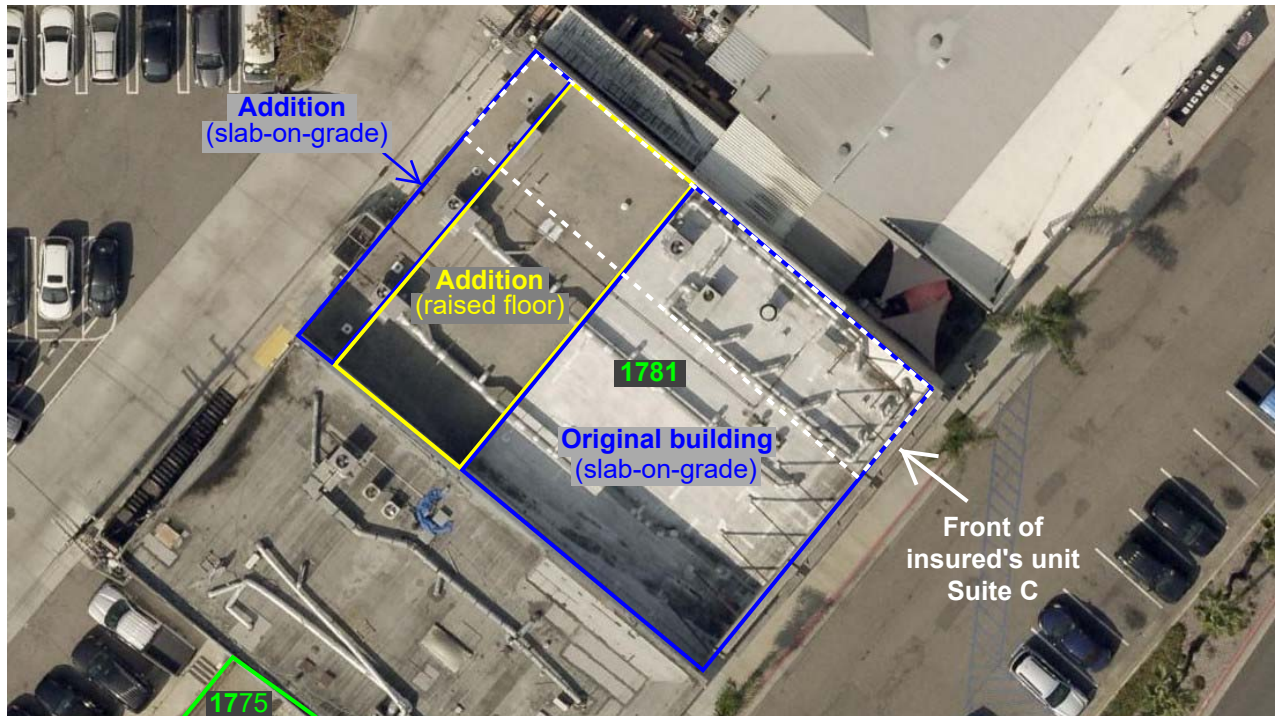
A recent aerial photo with annotations showing the location of the raised floor addition. Note the location of the nearby building 1775 Newport Blvd.
